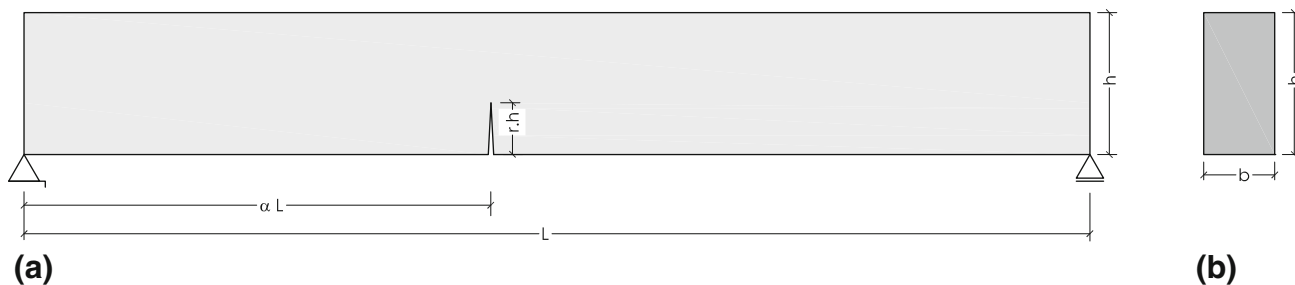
a Longitudinal view of the beam. b Cross section of the beam
